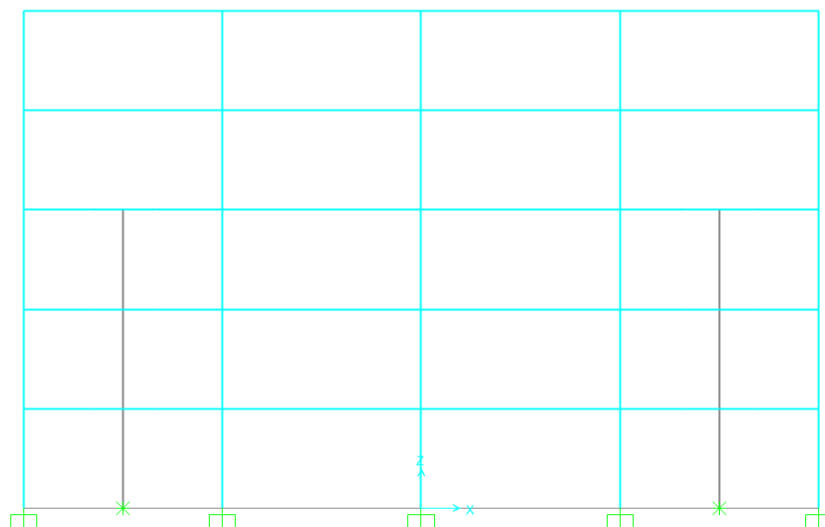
Example of distribution of reinforced concrete shear walls (in grey) into the existing moment resisting frame (in light blue)
